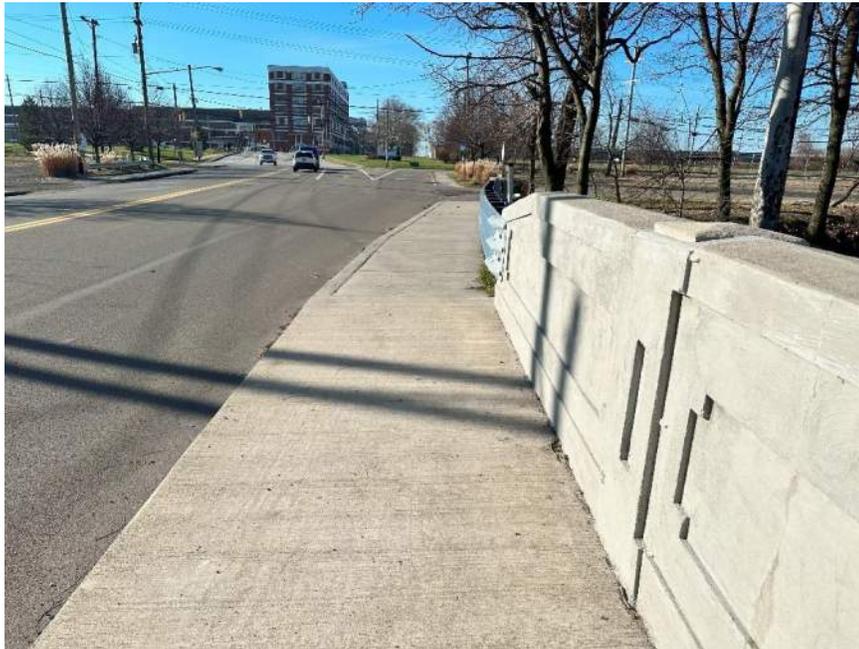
Looking west from the north side of the Main Street (SR 4032) bridge.
